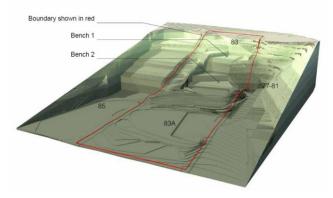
Topographical Map of the subject site demonstrating the existing ground level as a result of the excavation and modification to accommodate the existing dwellings (site boundary identified in red as viewed from the Harbour looking south) (Source: Urban Design Statement)
